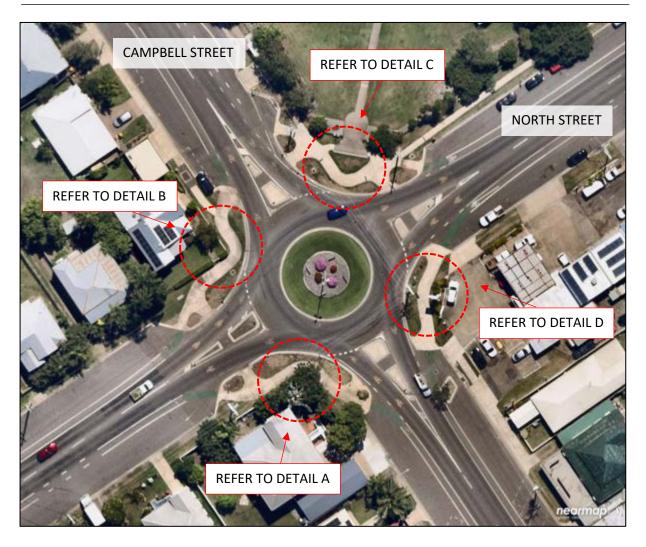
AERIAL OF THE CAMPBELL STREET / NORTH STREET INTERSECTION
